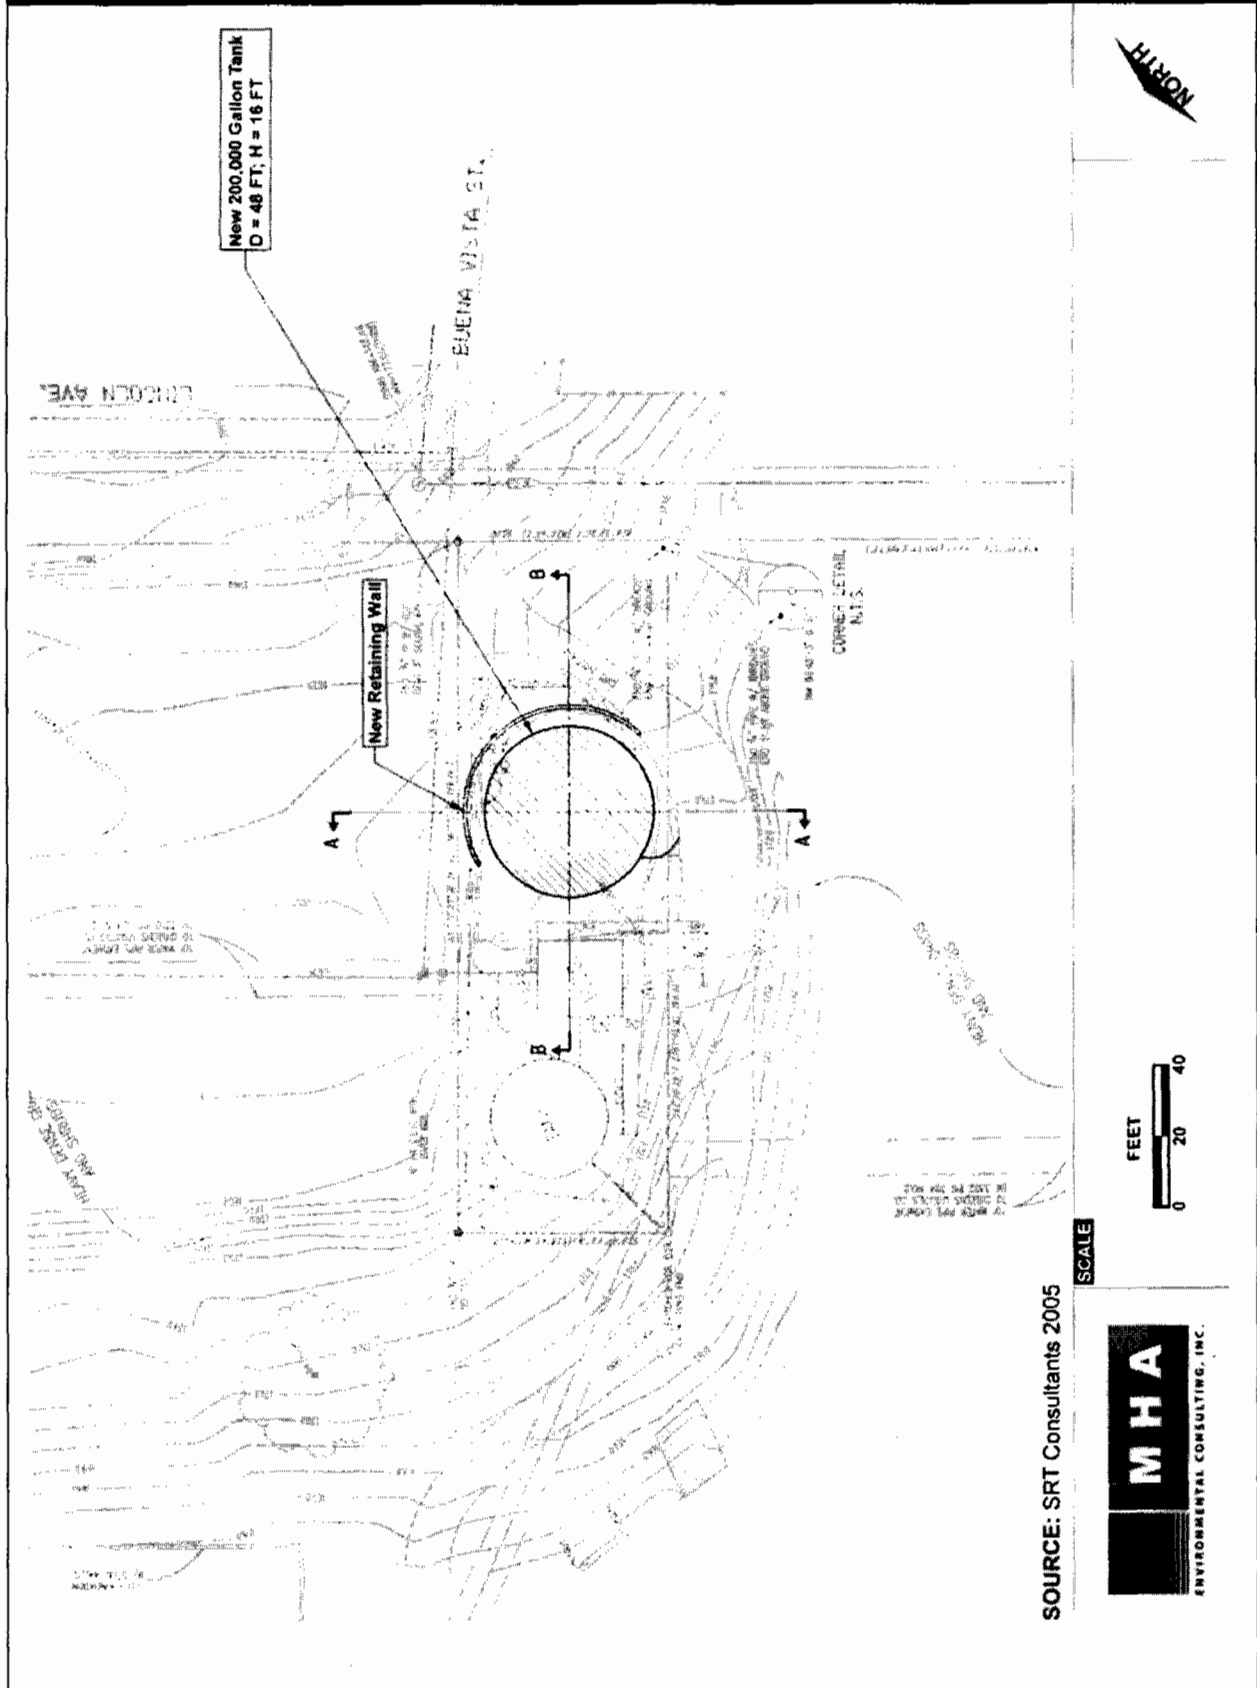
Proposed Schoolhouse Tank Site Plan
